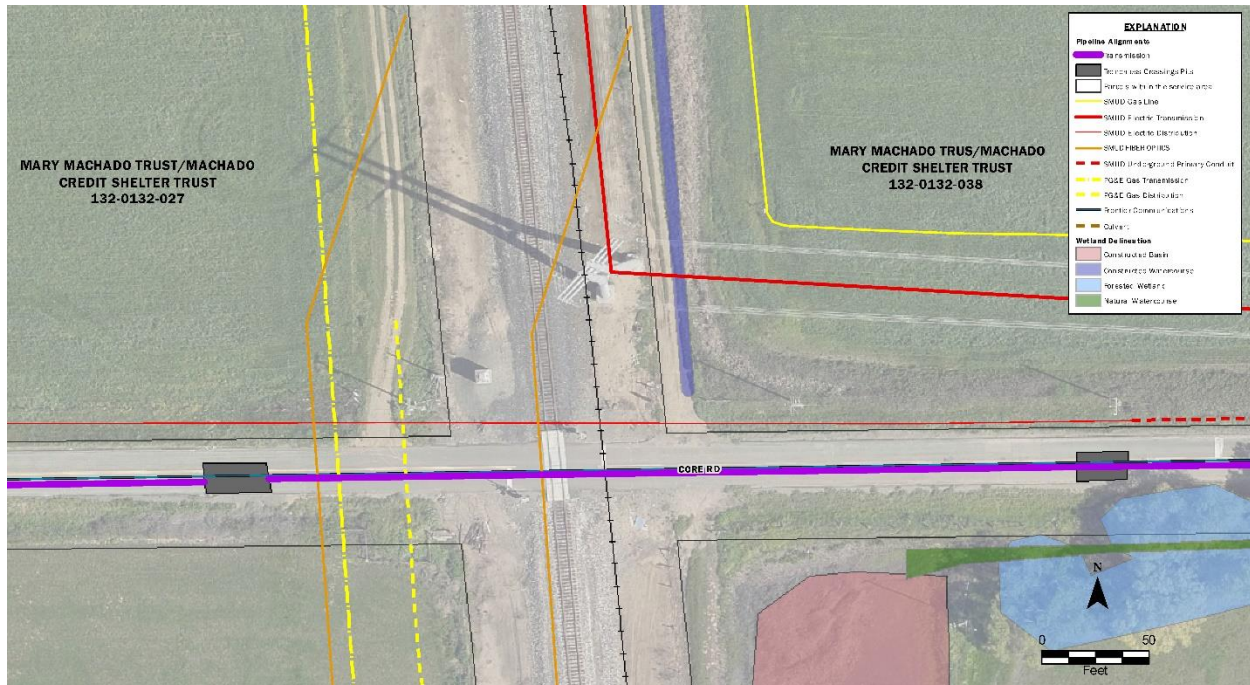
Proposed Trenchless Crossing of UPRR at Core Road
